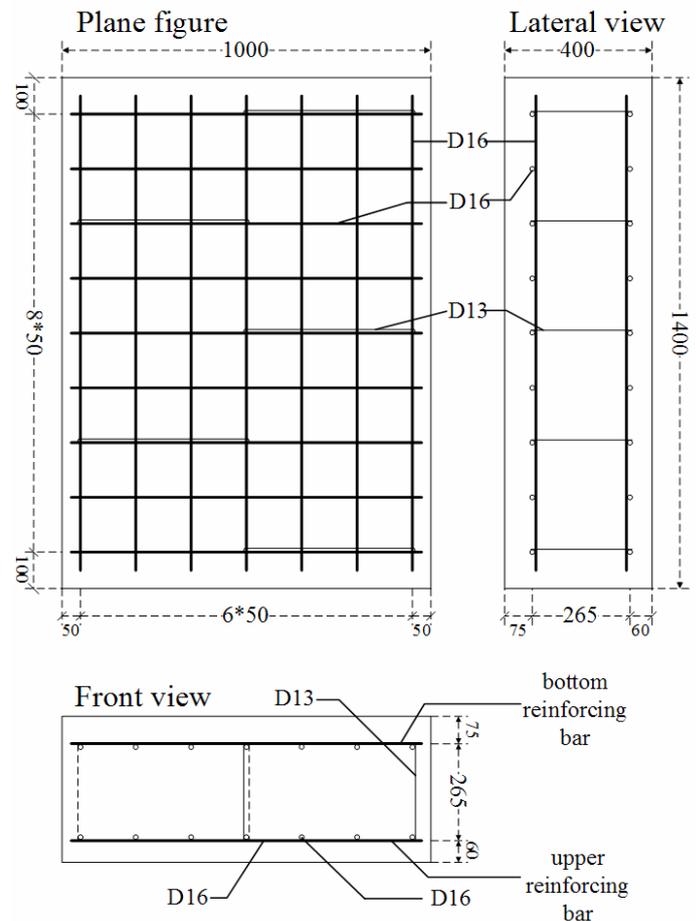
Schematic drawing of reinforcement arranged in the specimen.
